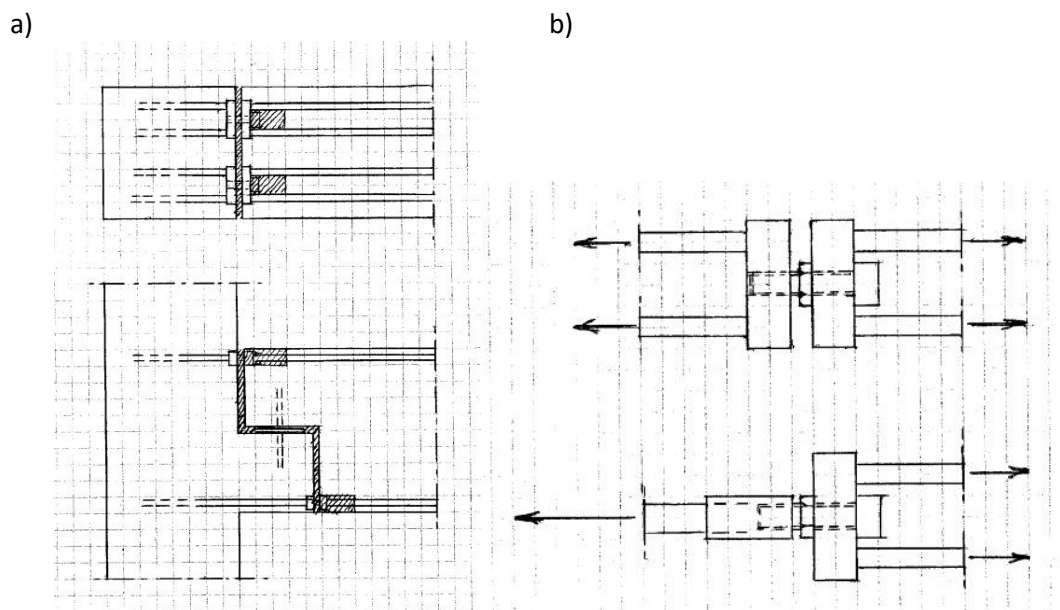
Recommended moment resisting connections presented in “Design Guidelines for Connections of Precast Structures under Seismic Action” publication of 2012, with mechanical couplers, top and side view of a connection, b) details of mechanical couplers .
